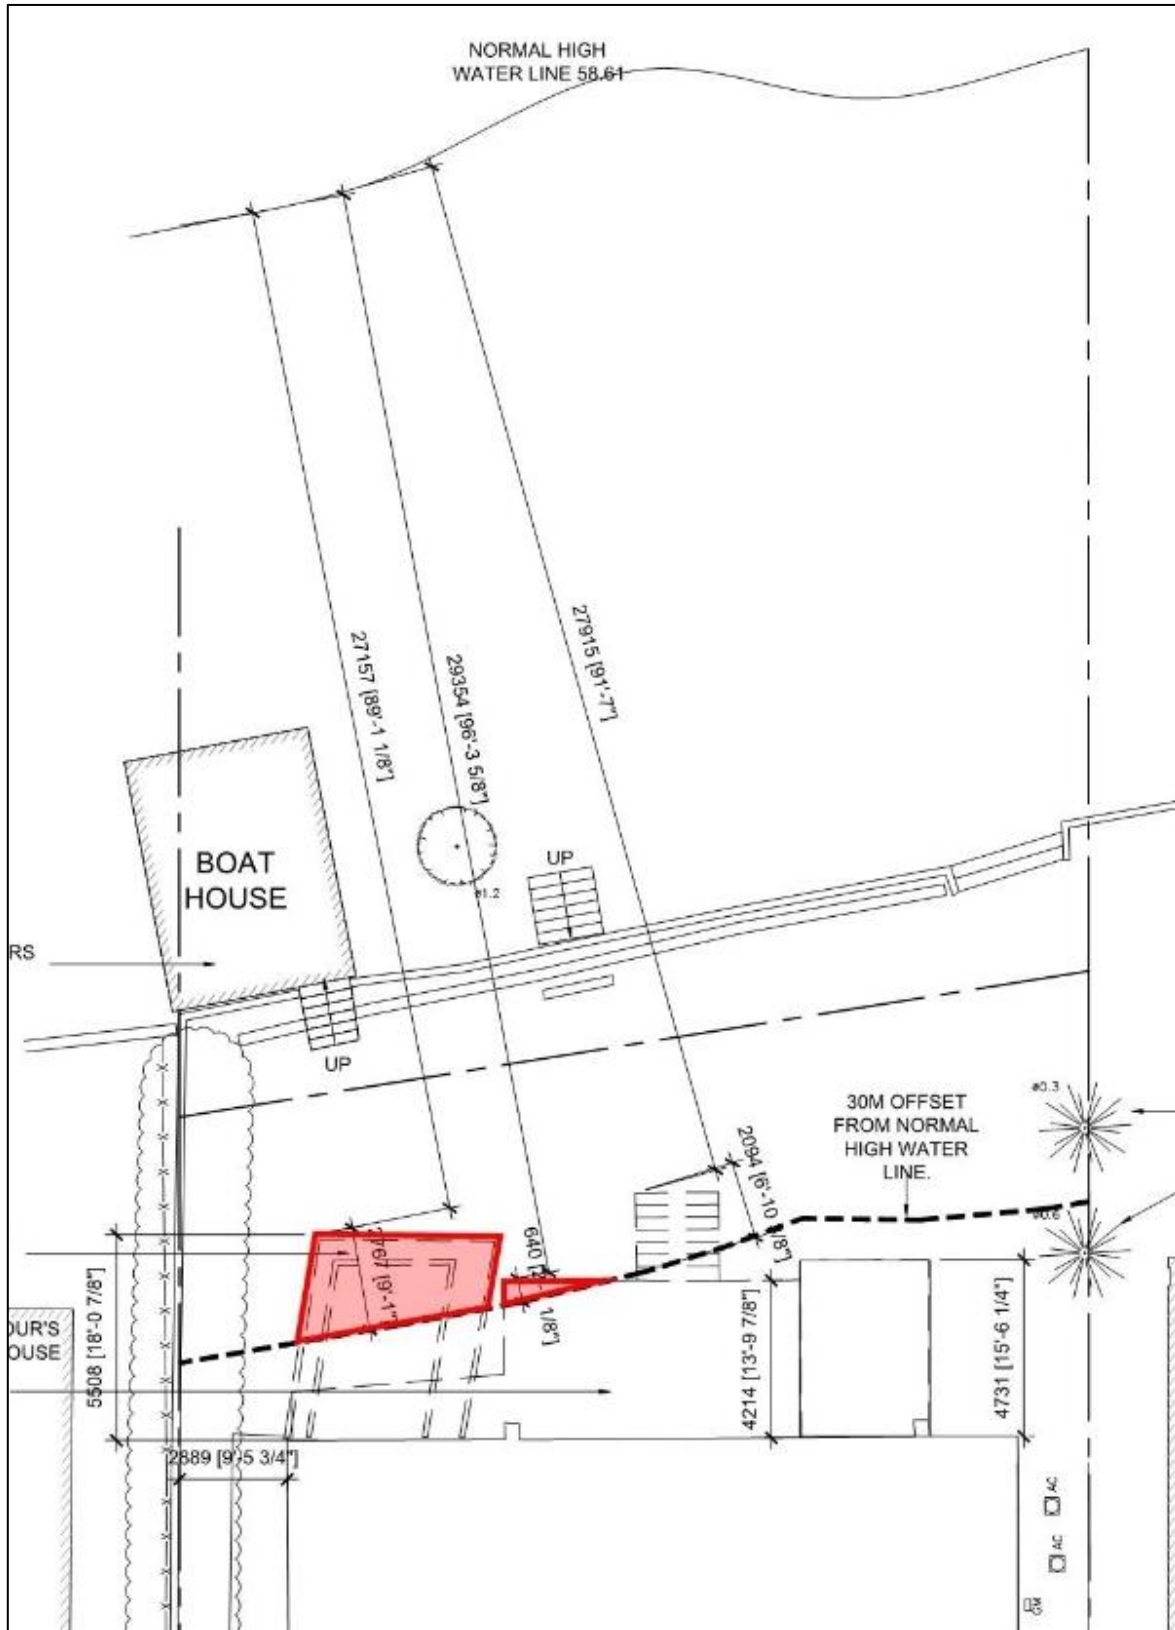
Site Plan excerpt (existing dwelling). (Source: Flynn Architect).
